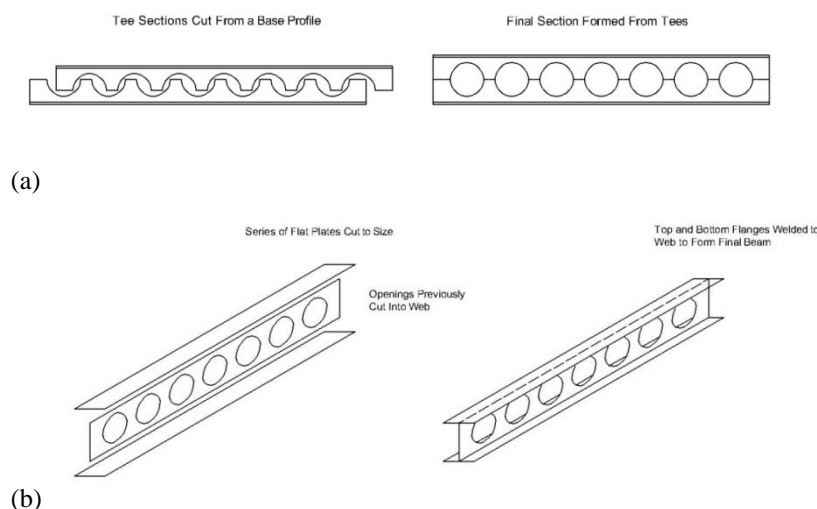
a) Castellation technique; b) Plate assembly technique for fabricating perforated beams
